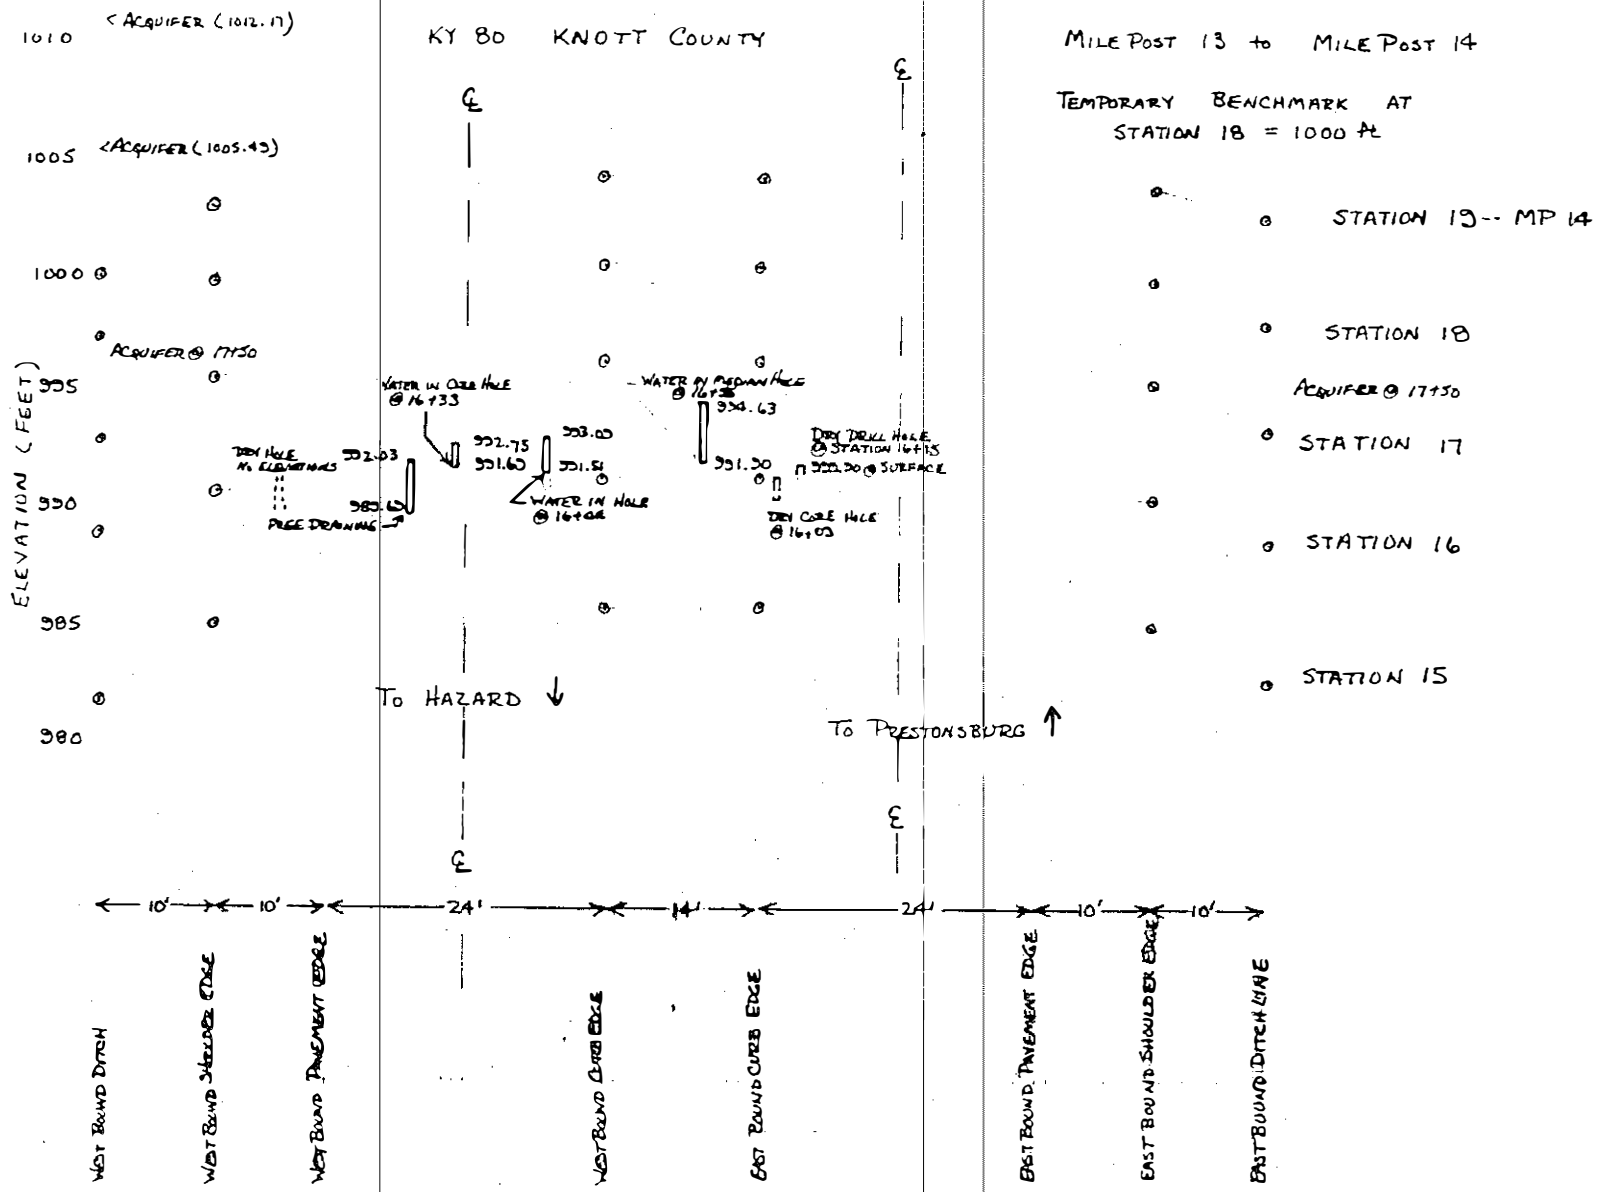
Association of Seepages and Groundwater Elevations with Roadway Cross Section at Milepost 13 to Milepost 14.
